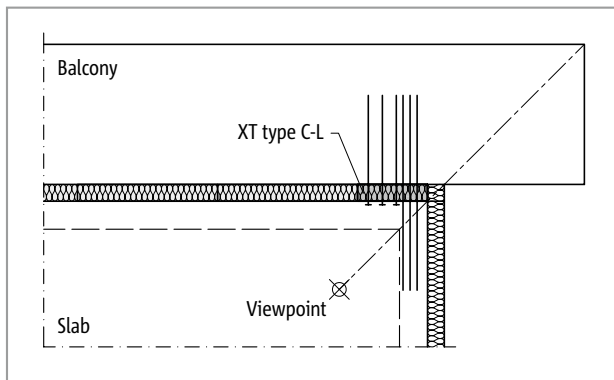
Schöck Isokorb® XT type C: Balcony projecting over corner of building (application XT type C-L)
